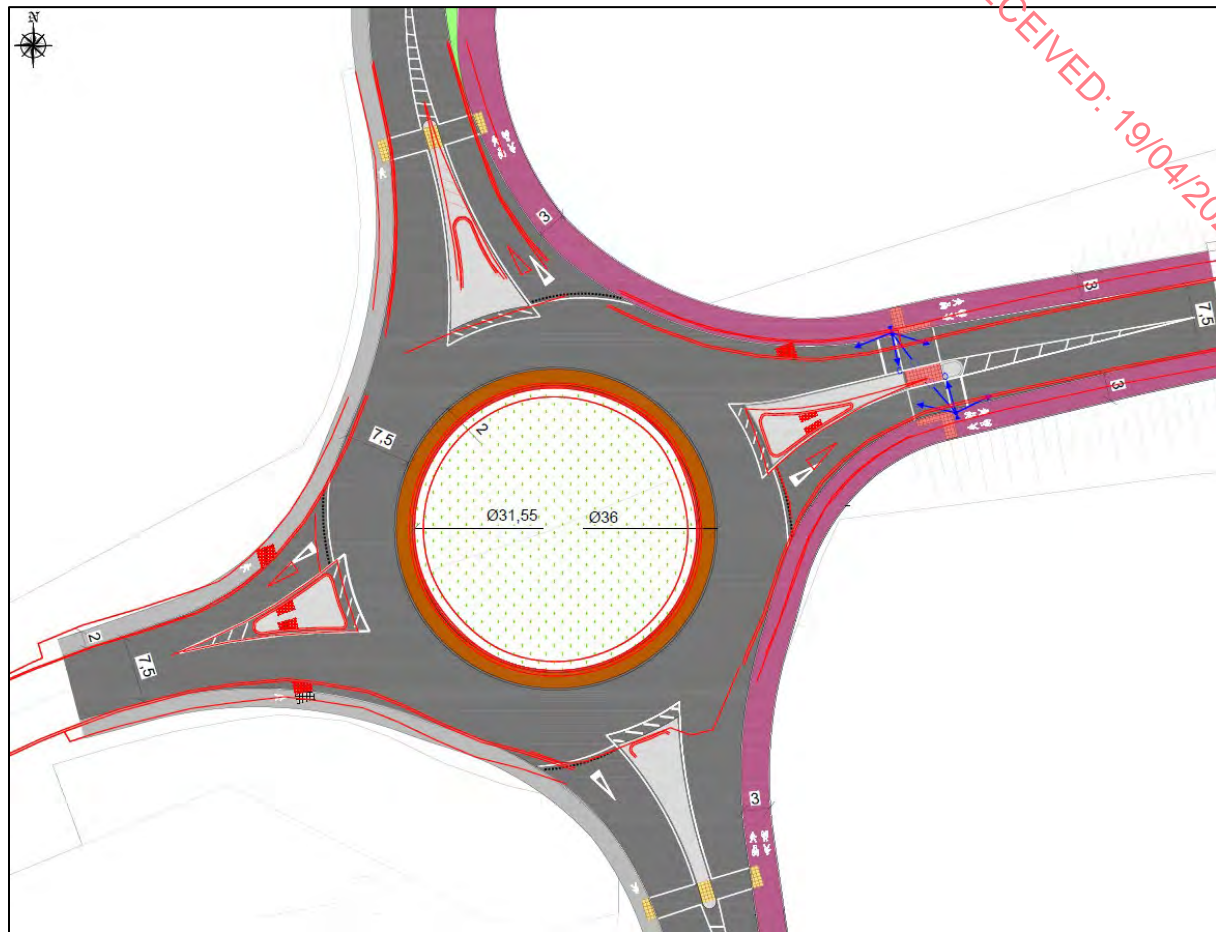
Proposed alterations to Bhailsigh Road (L1140) roundabout.
